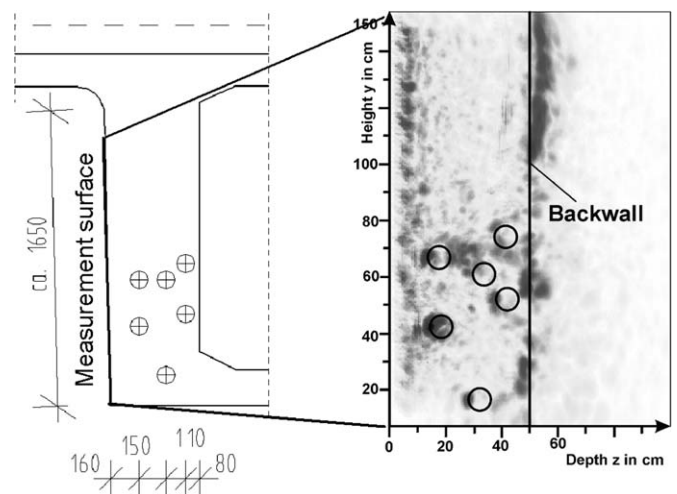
Arrangement of tendon ducts in the cross section (at  $x = 6000$  mm) of a box girder web in Austria, left: according to construction plan, right: located at a SAFT-B-projection by ultrasonic pulse echo technique.
